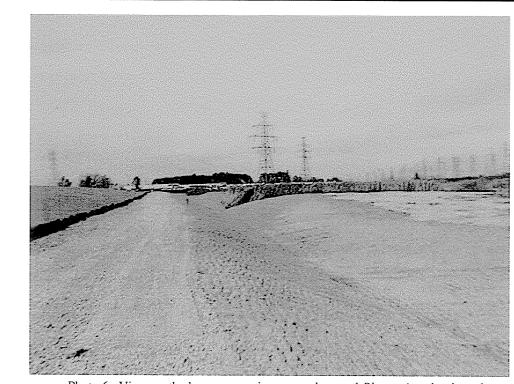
View north along new perimeter road toward *Phragmites*-dominated emergent wetland near east side of AIRCO property; new drainage swale to right.
